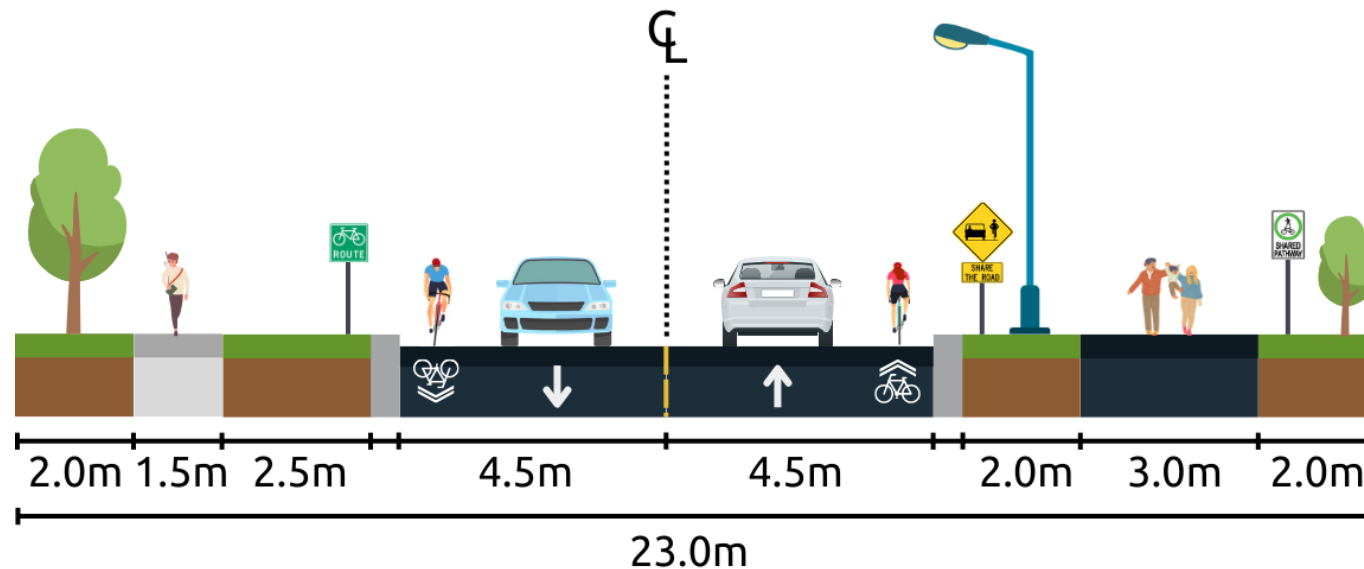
Collector Road Cross Section Example (with Cycling Enhancements)
